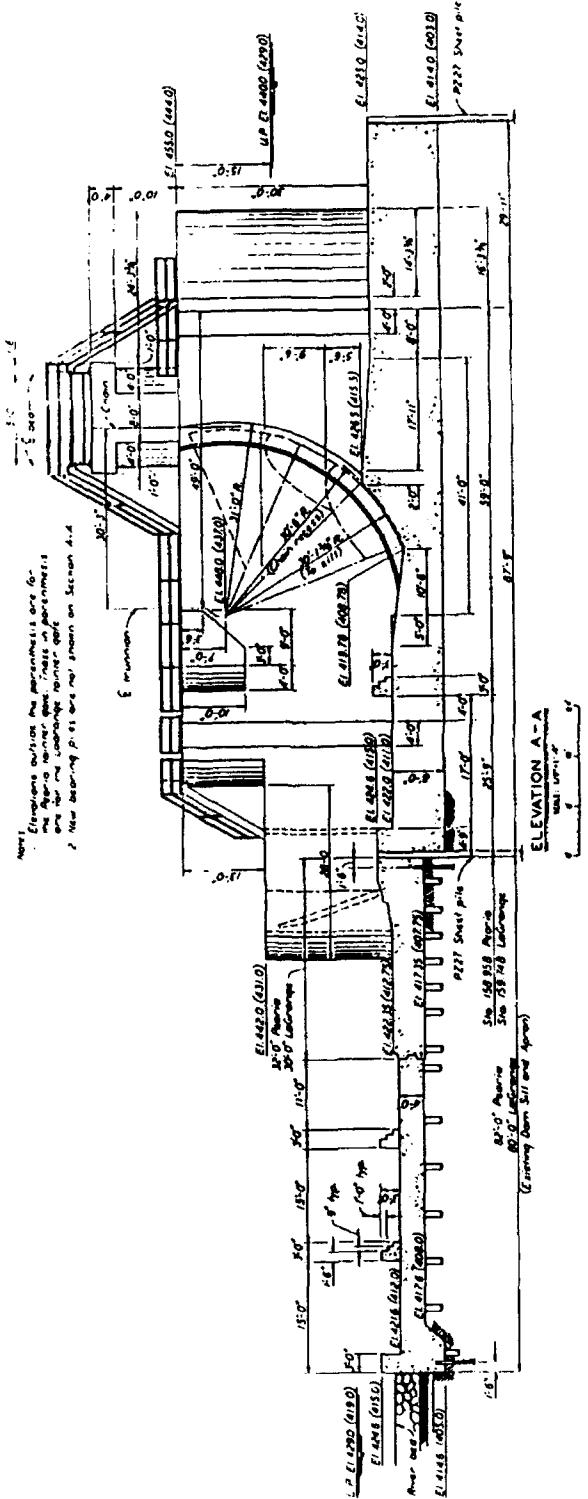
Peoria and LaGrange Dams—tainter gate piers, sill, and apron-elevation
